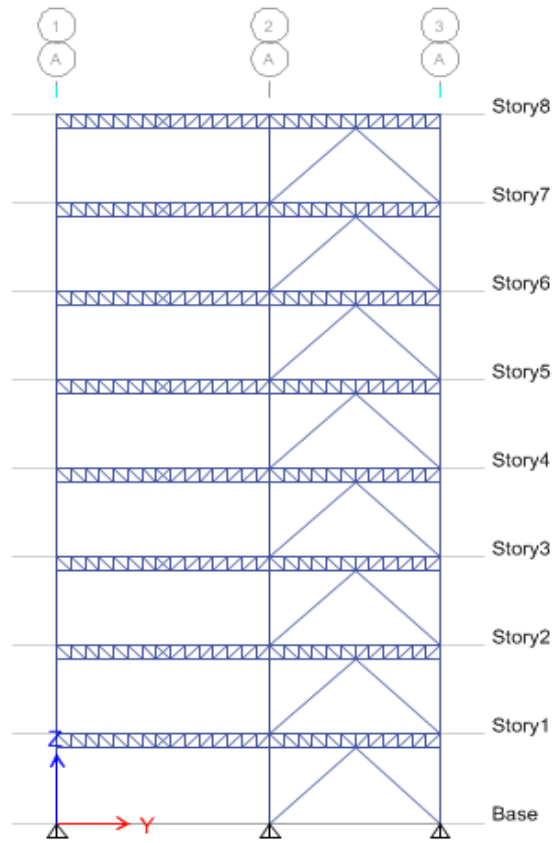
Typical truss beam and bracing elevation of the dormitory building (RB-T) in y-direction.
